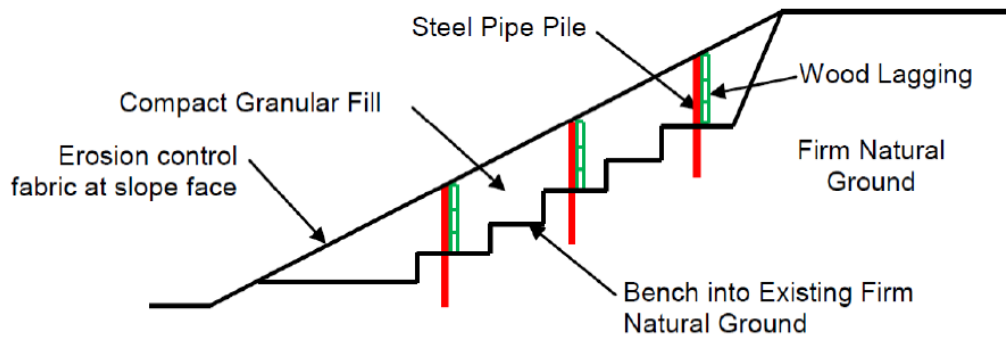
Steel pipe pile and wood lagging rehabilitation method (Day, 1997; Sapkota 2019)
